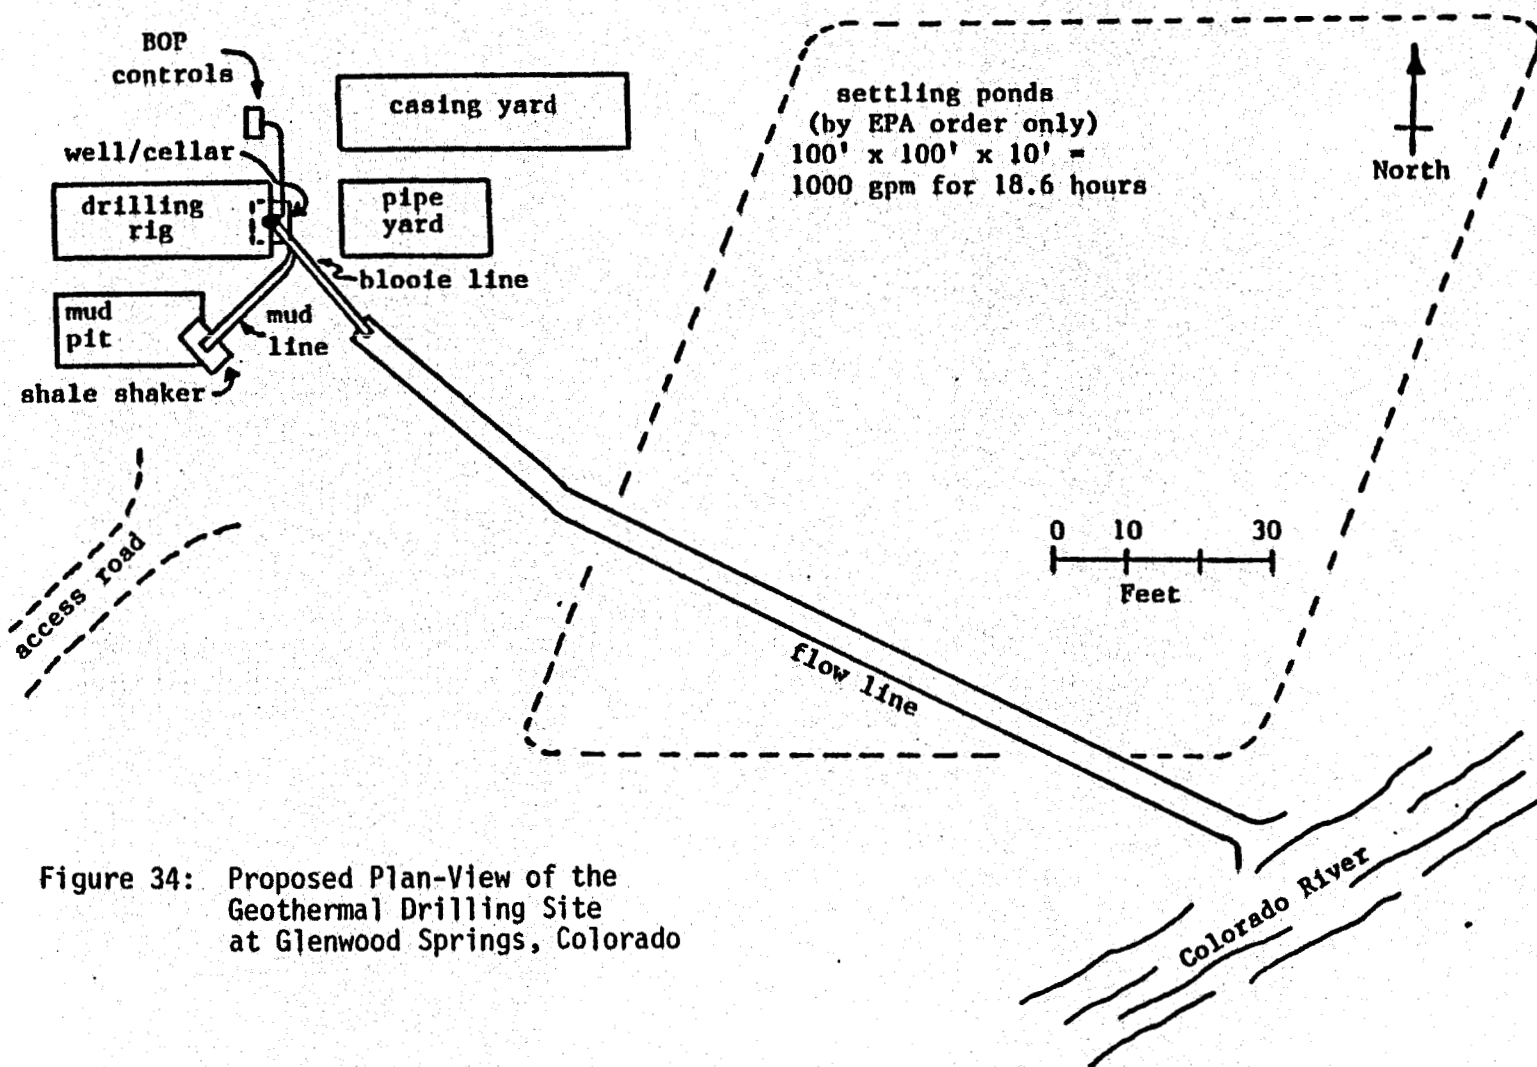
Proposed Plan-View of the Geothermal Drilling Site at Glenwood Springs, Colorado
